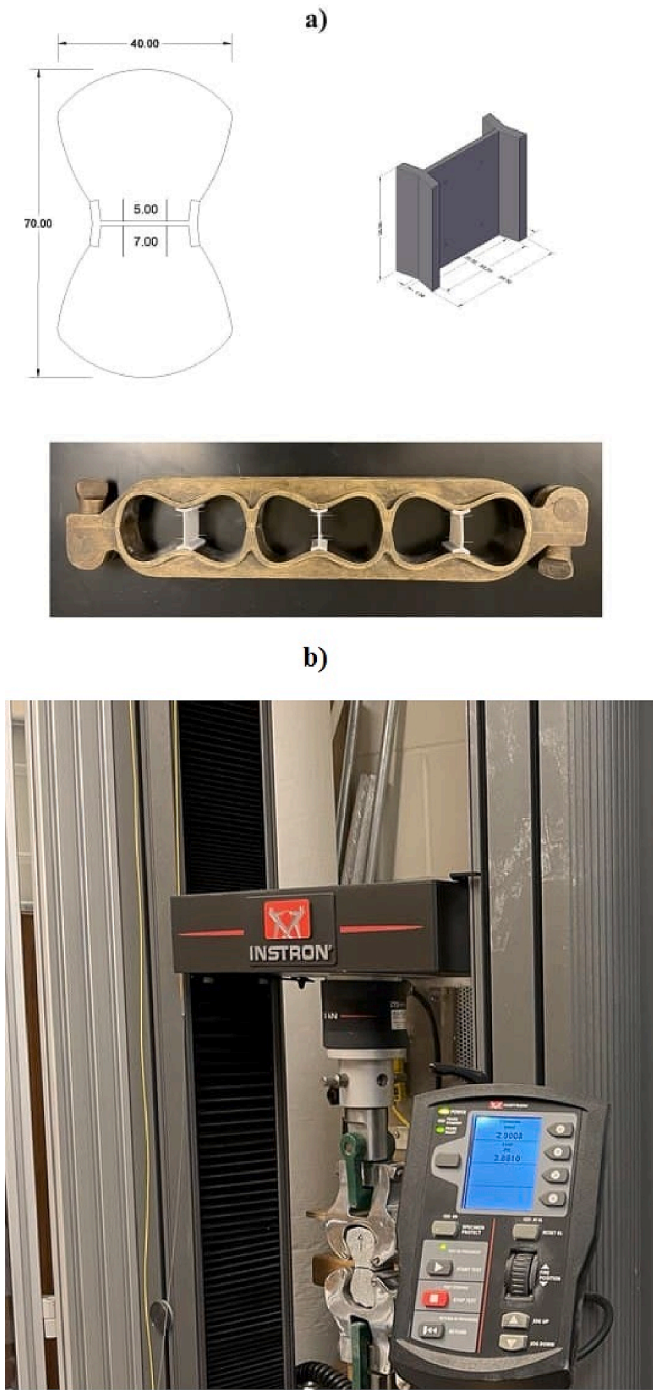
(a) Schematic view of fiber pull-out sample, embedded plastic clip, and mold, (dimensions in mm); (b) fiber pull-out by Instron universal testing machine.
